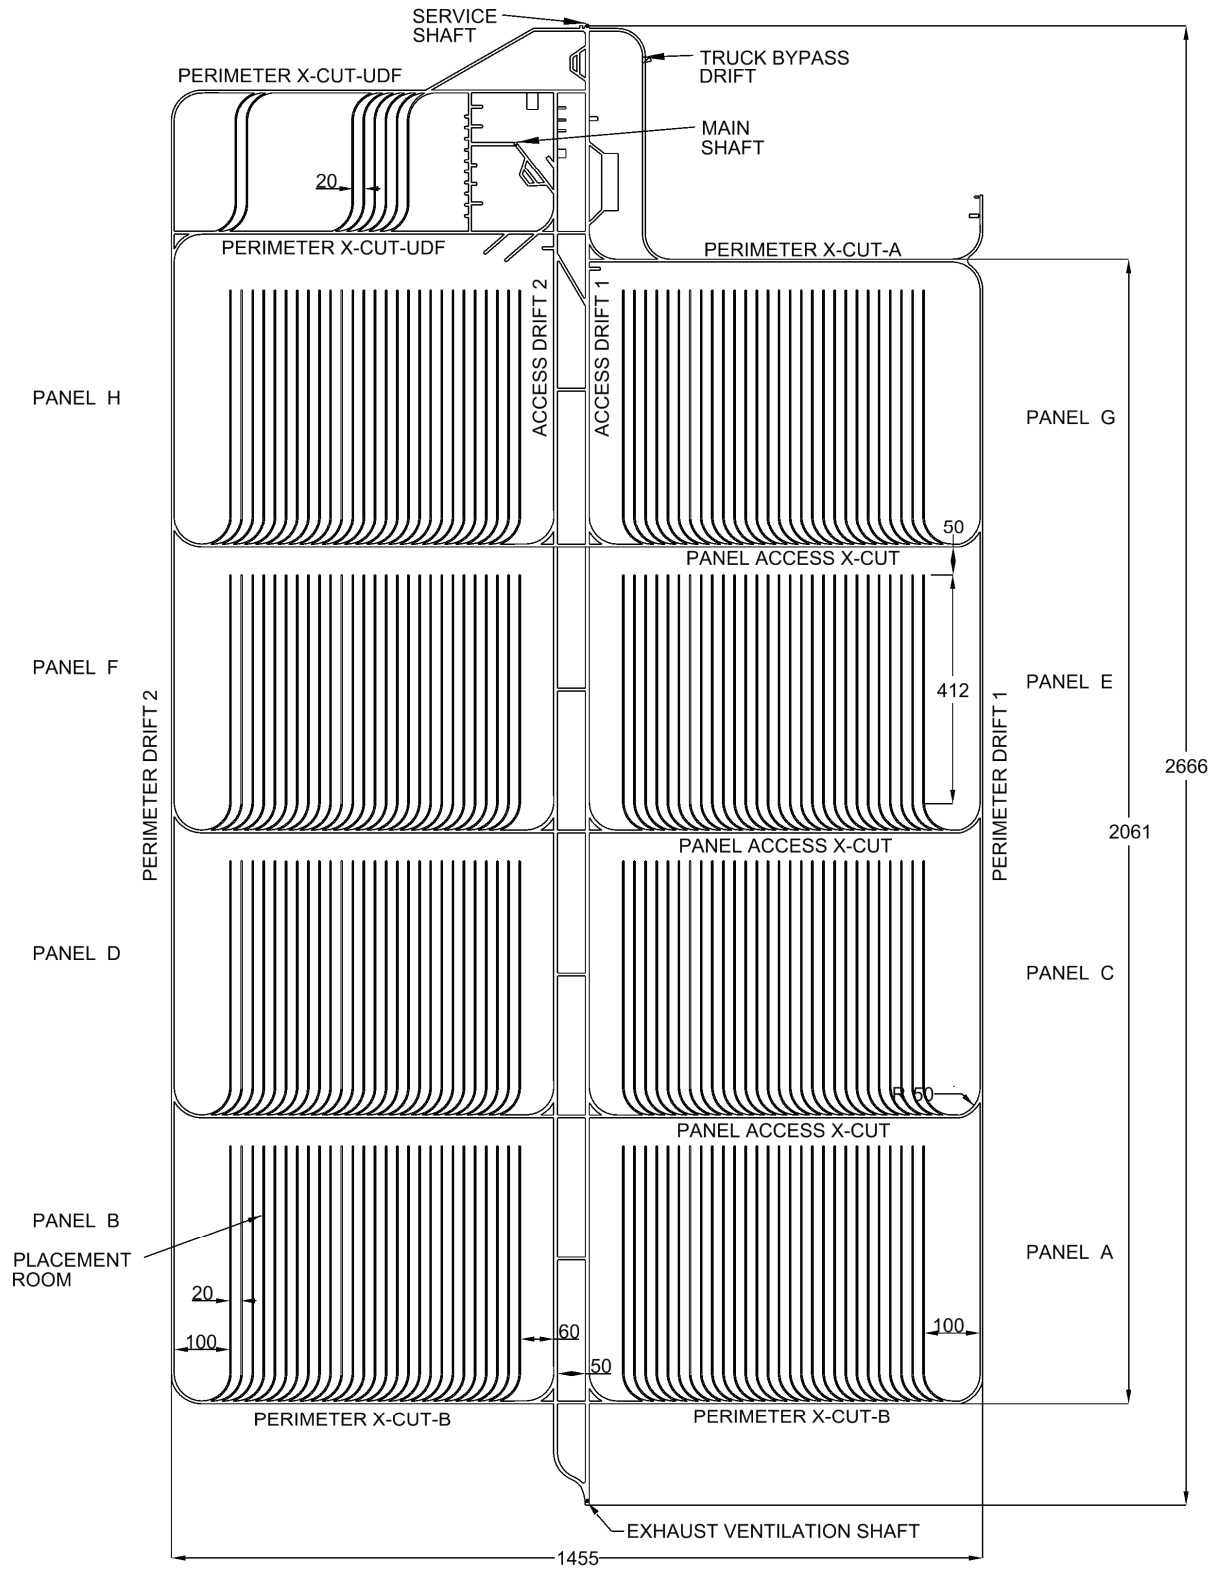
Example Underground Repository Layout in Sedimentary Rock.
